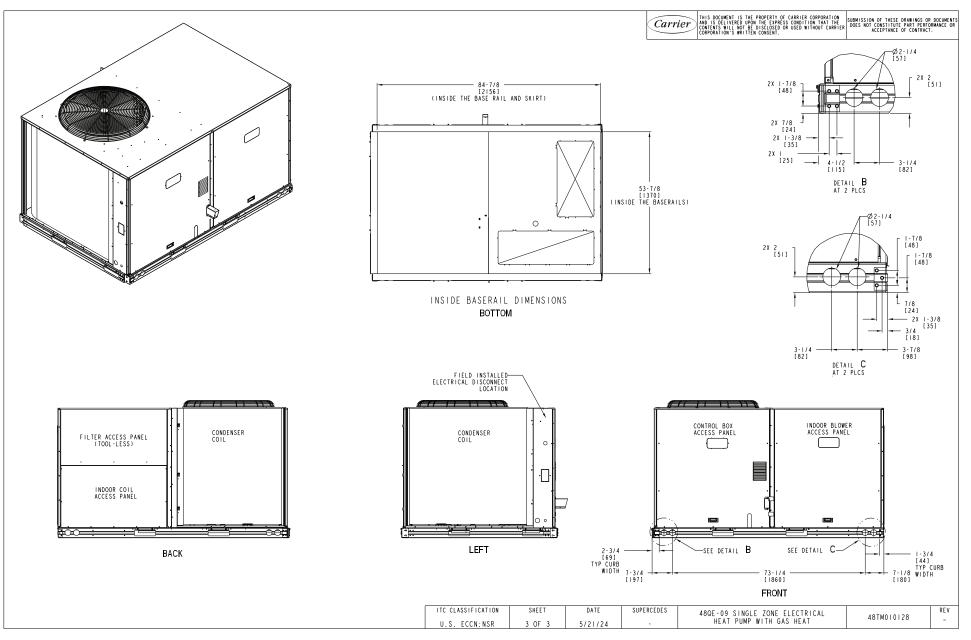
48QE 09 Unit Dimensional Drawing (cont)
